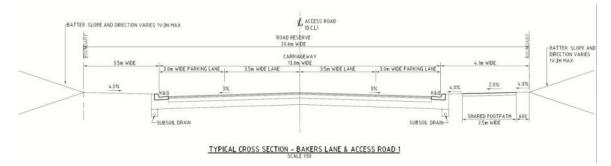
Estate Road – Typical Cross Section (Bakers Lane & Road 1)
